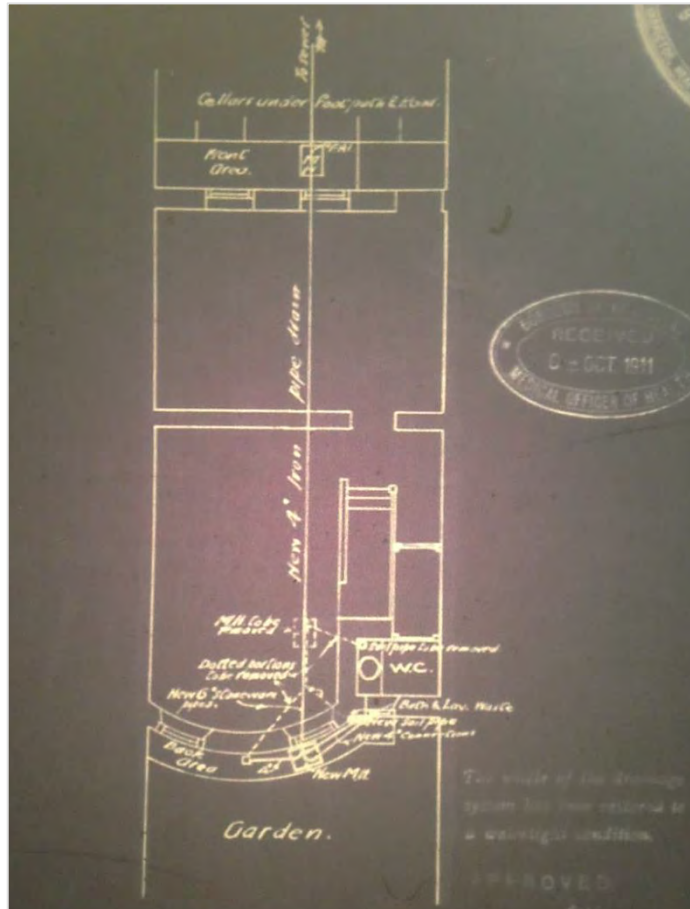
1911 drainage plan: lower ground floor¹³
